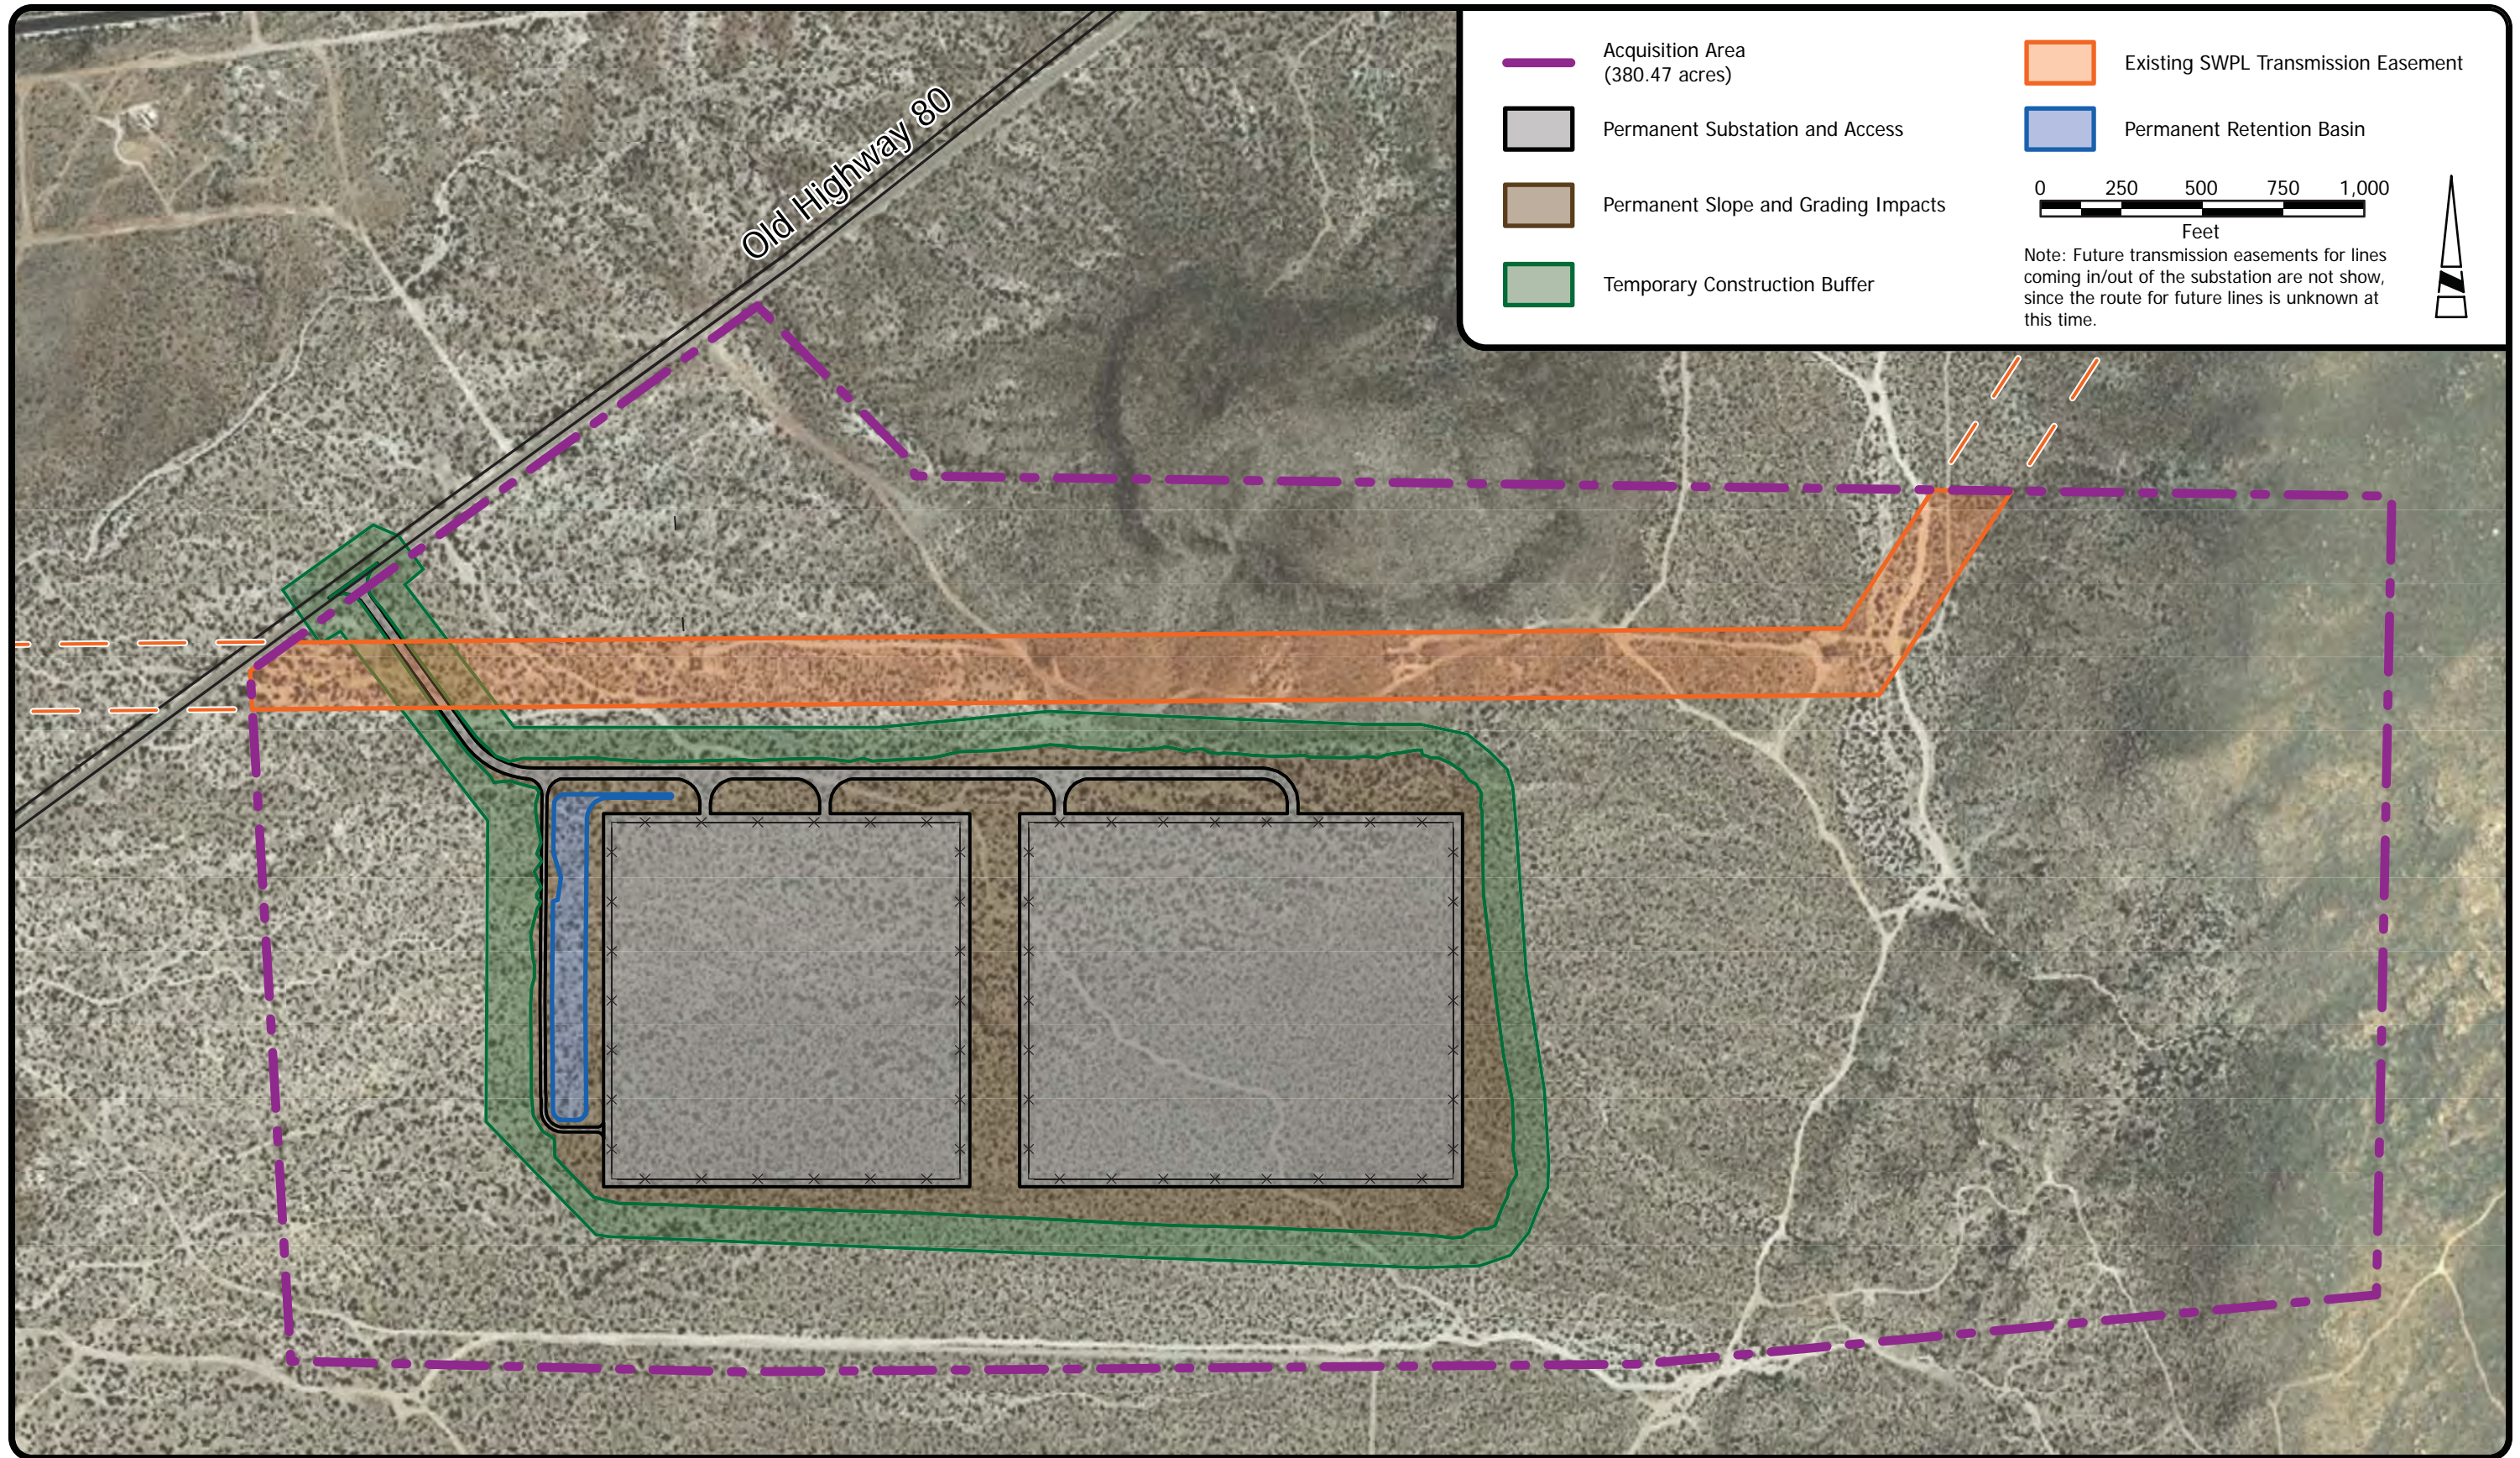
ECO Substation Revised Footprint Conceptual Layout
